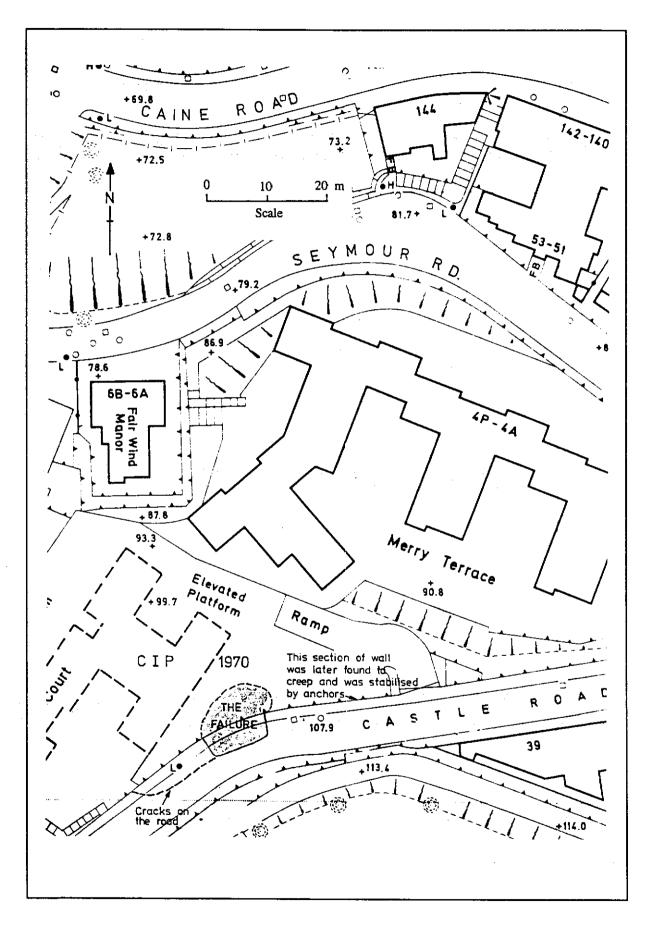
Retaining Wall at 10, Castle Road - Site Plan
